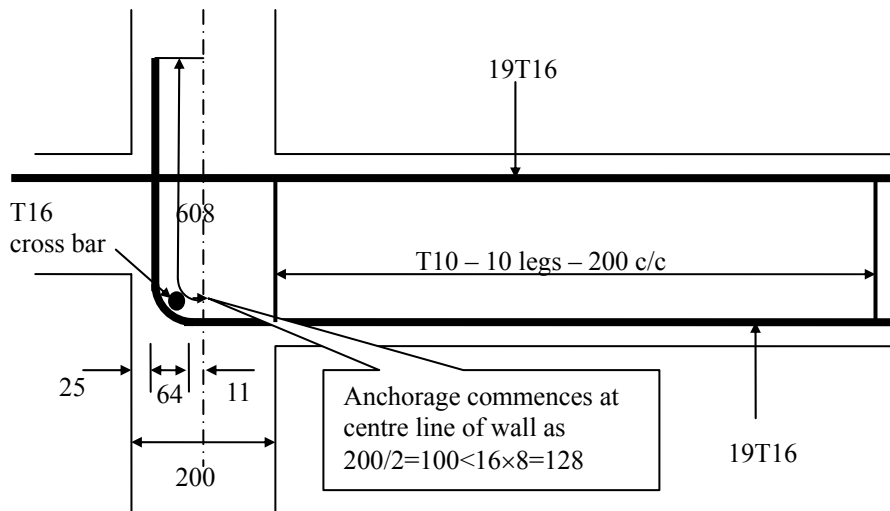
Anchorage Details at Support for Worked Example 3.12
